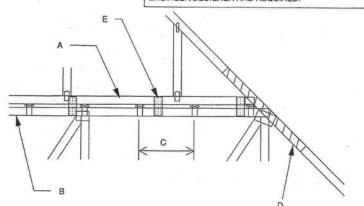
DETAIL IS NOT APPLICABLE FOR TRUSSES TRANSFERING DRAG LOADS (SHEAR TRUSSES). ADDITIONAL CONSIDERATIONS BY BUILDING ENGINEER/DESIGNER ARE REQUIRED.
